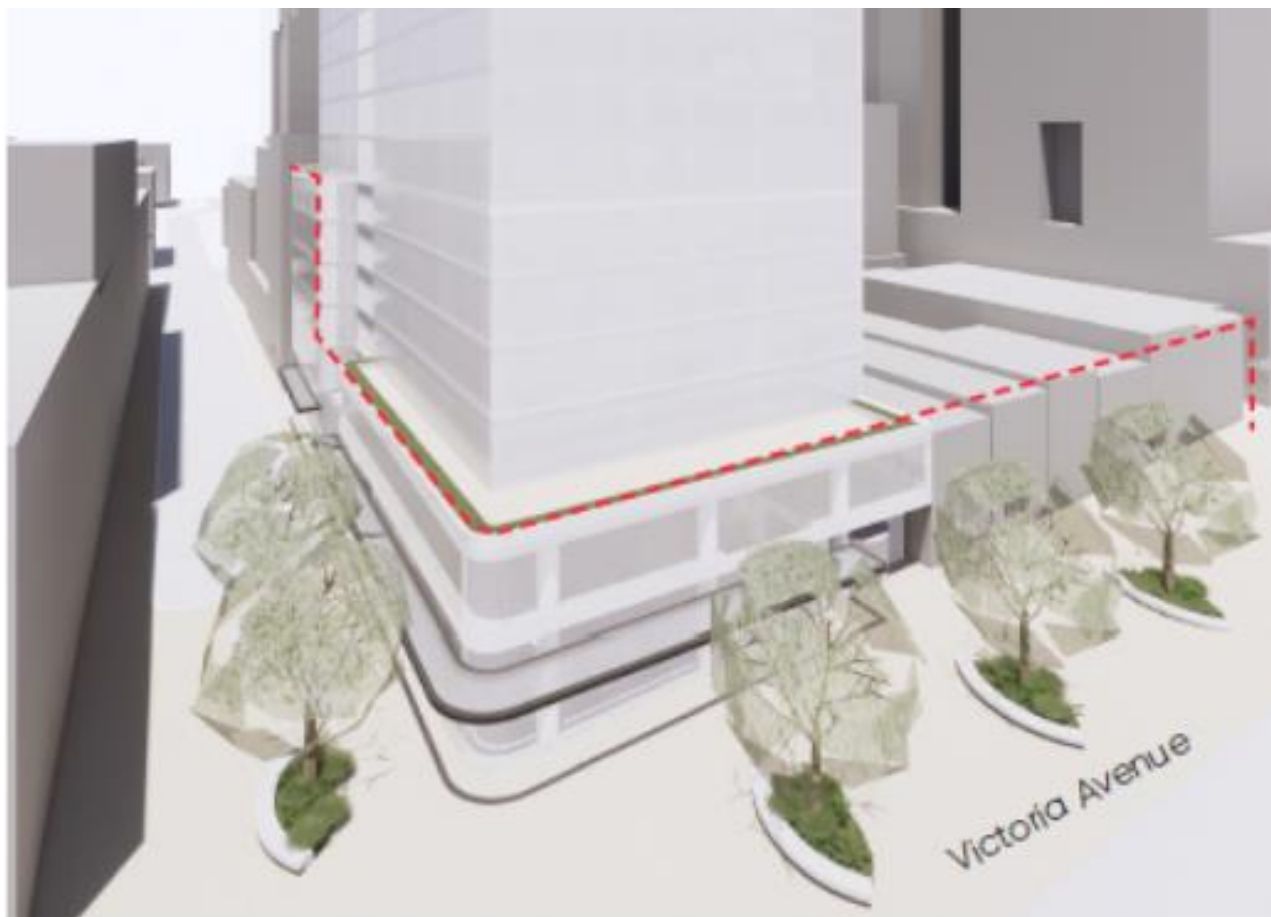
Concept of the proposed podium height, looking south-west (source: Mirvac Design)
